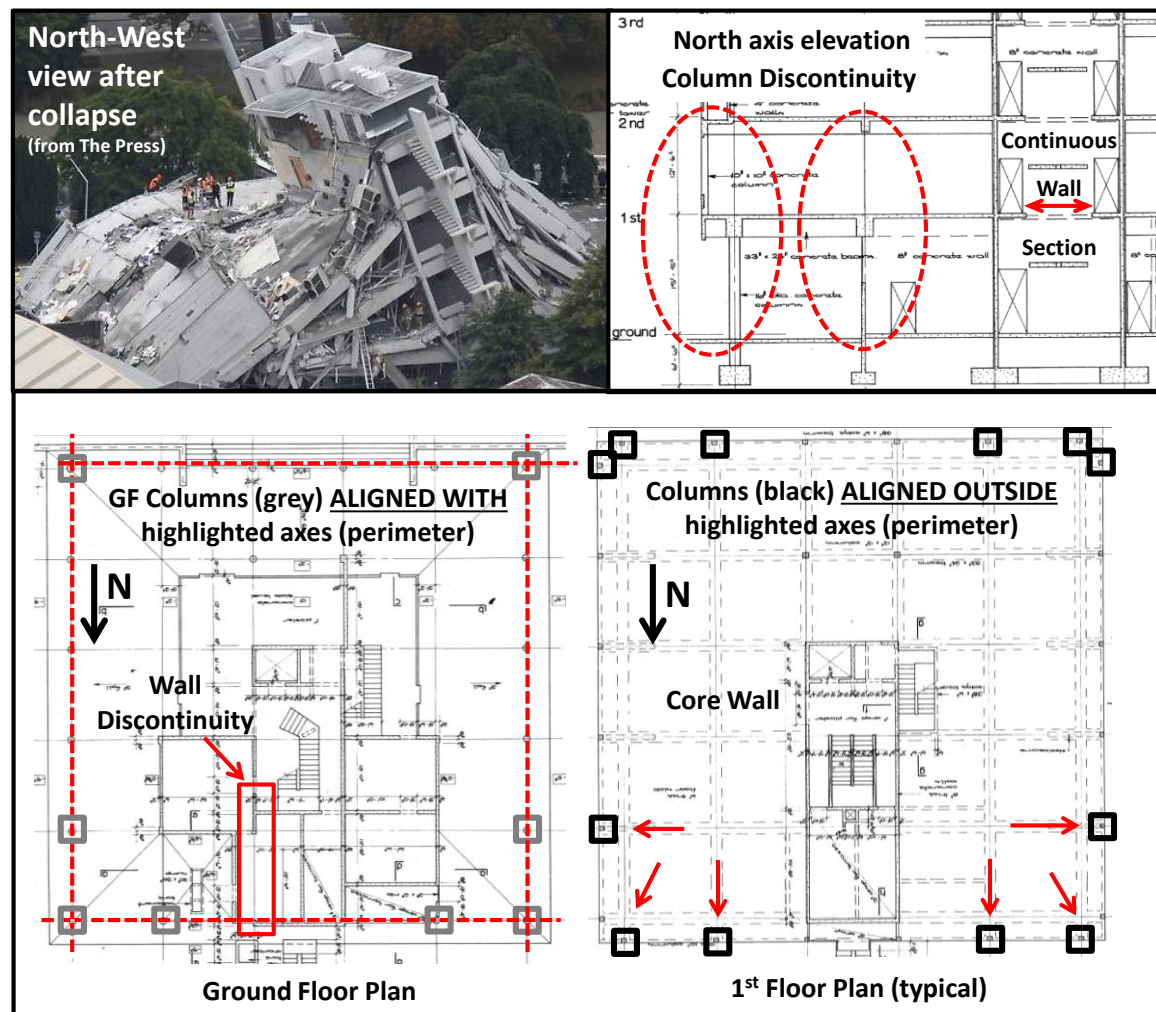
Building E: Collapsed 5-storey RC building in Christchurch, during the 22 February Canterbury Earthquake (from The Press), constructed with one core structural wall (singly reinforced) and gravity load (ordinary) frames with a discontinuity in the ground floor level.
